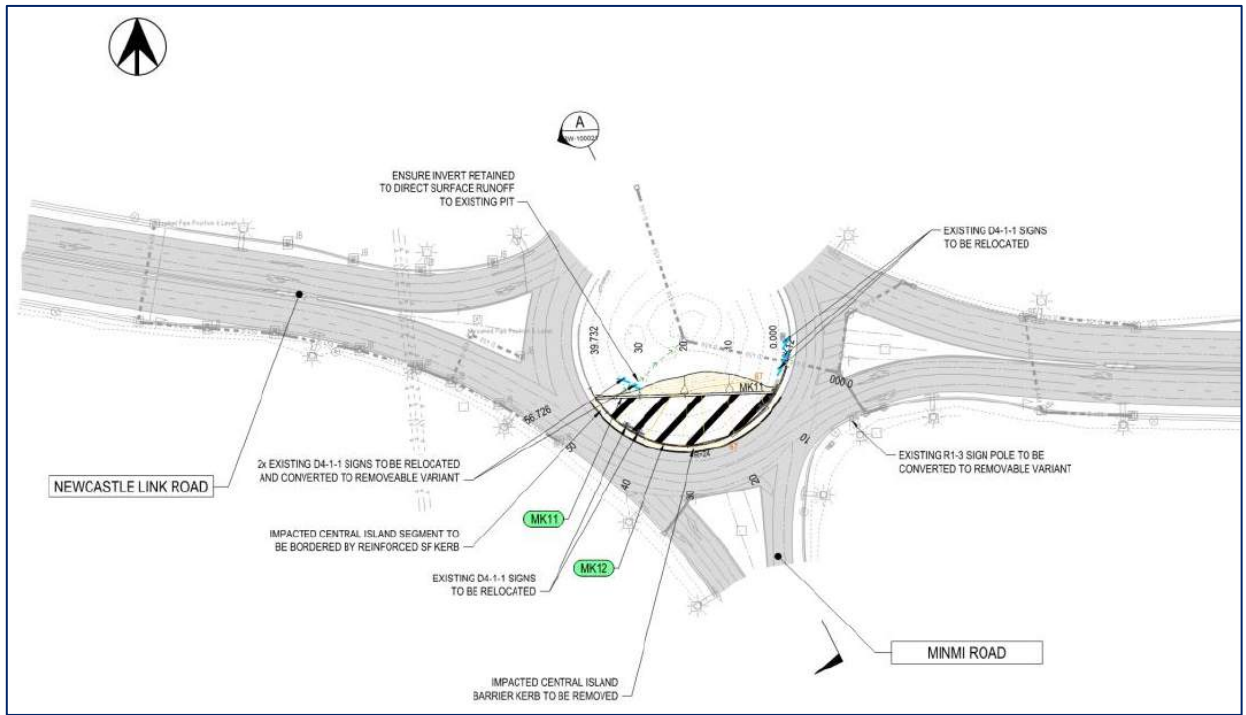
Site 10 proposed works at roundabout on Newcastle Link Road at the intersection of Minmi Road
